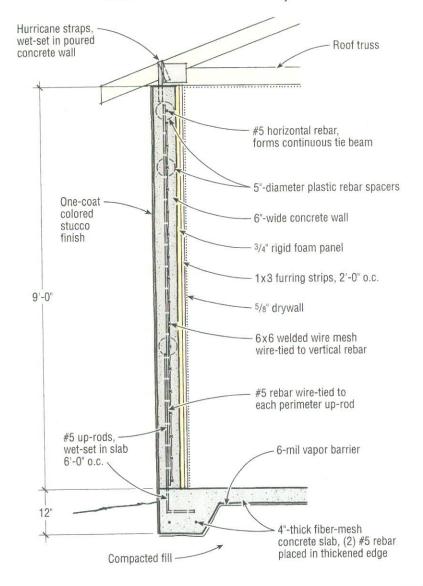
The author installs cast-in-place walls on the thickened edge of a slab-on-grade building platform. No. 5 rebar "up-rods" are wet-set into the slab and, once cured, wire-tied to the wall reinforcement.
